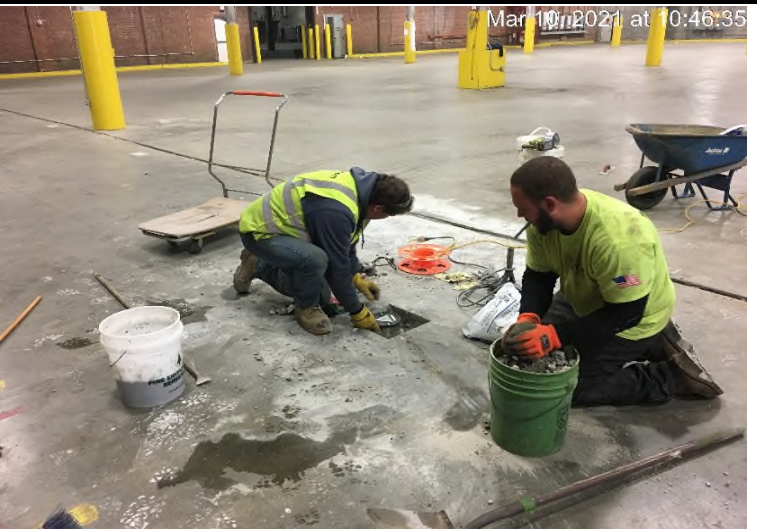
Eastern advancing a soil boring in the building interior, on the southwestern portion of the Site.
